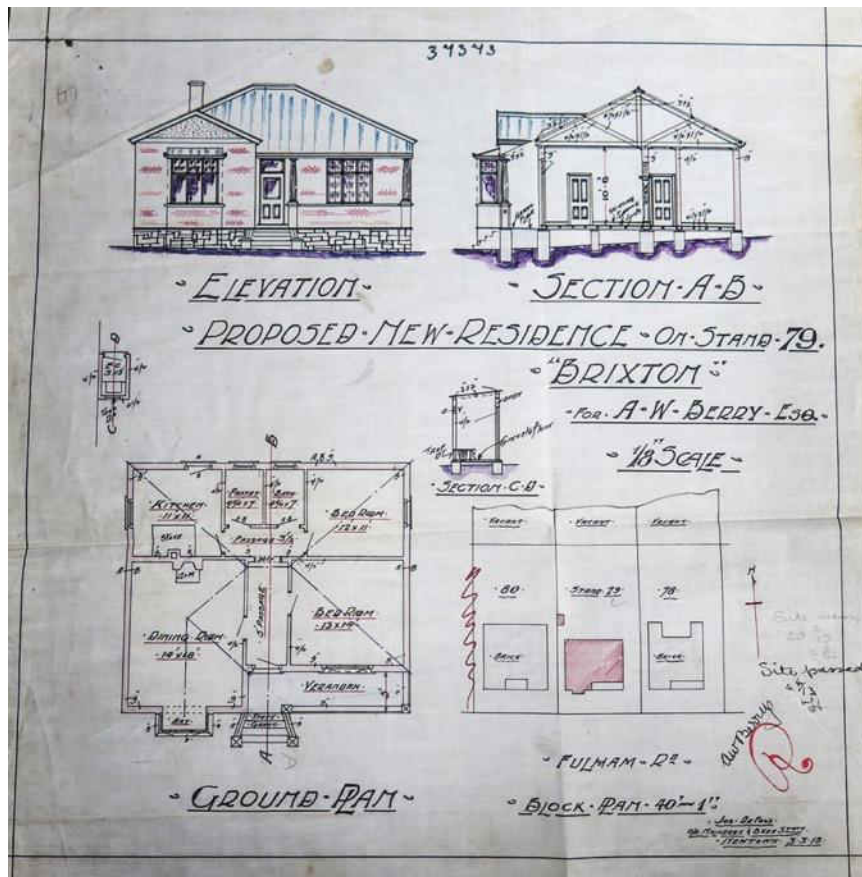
Plan for freestanding house close to street edge with bay window, corrugated iron roof, side stoep and central doorway from 1913
